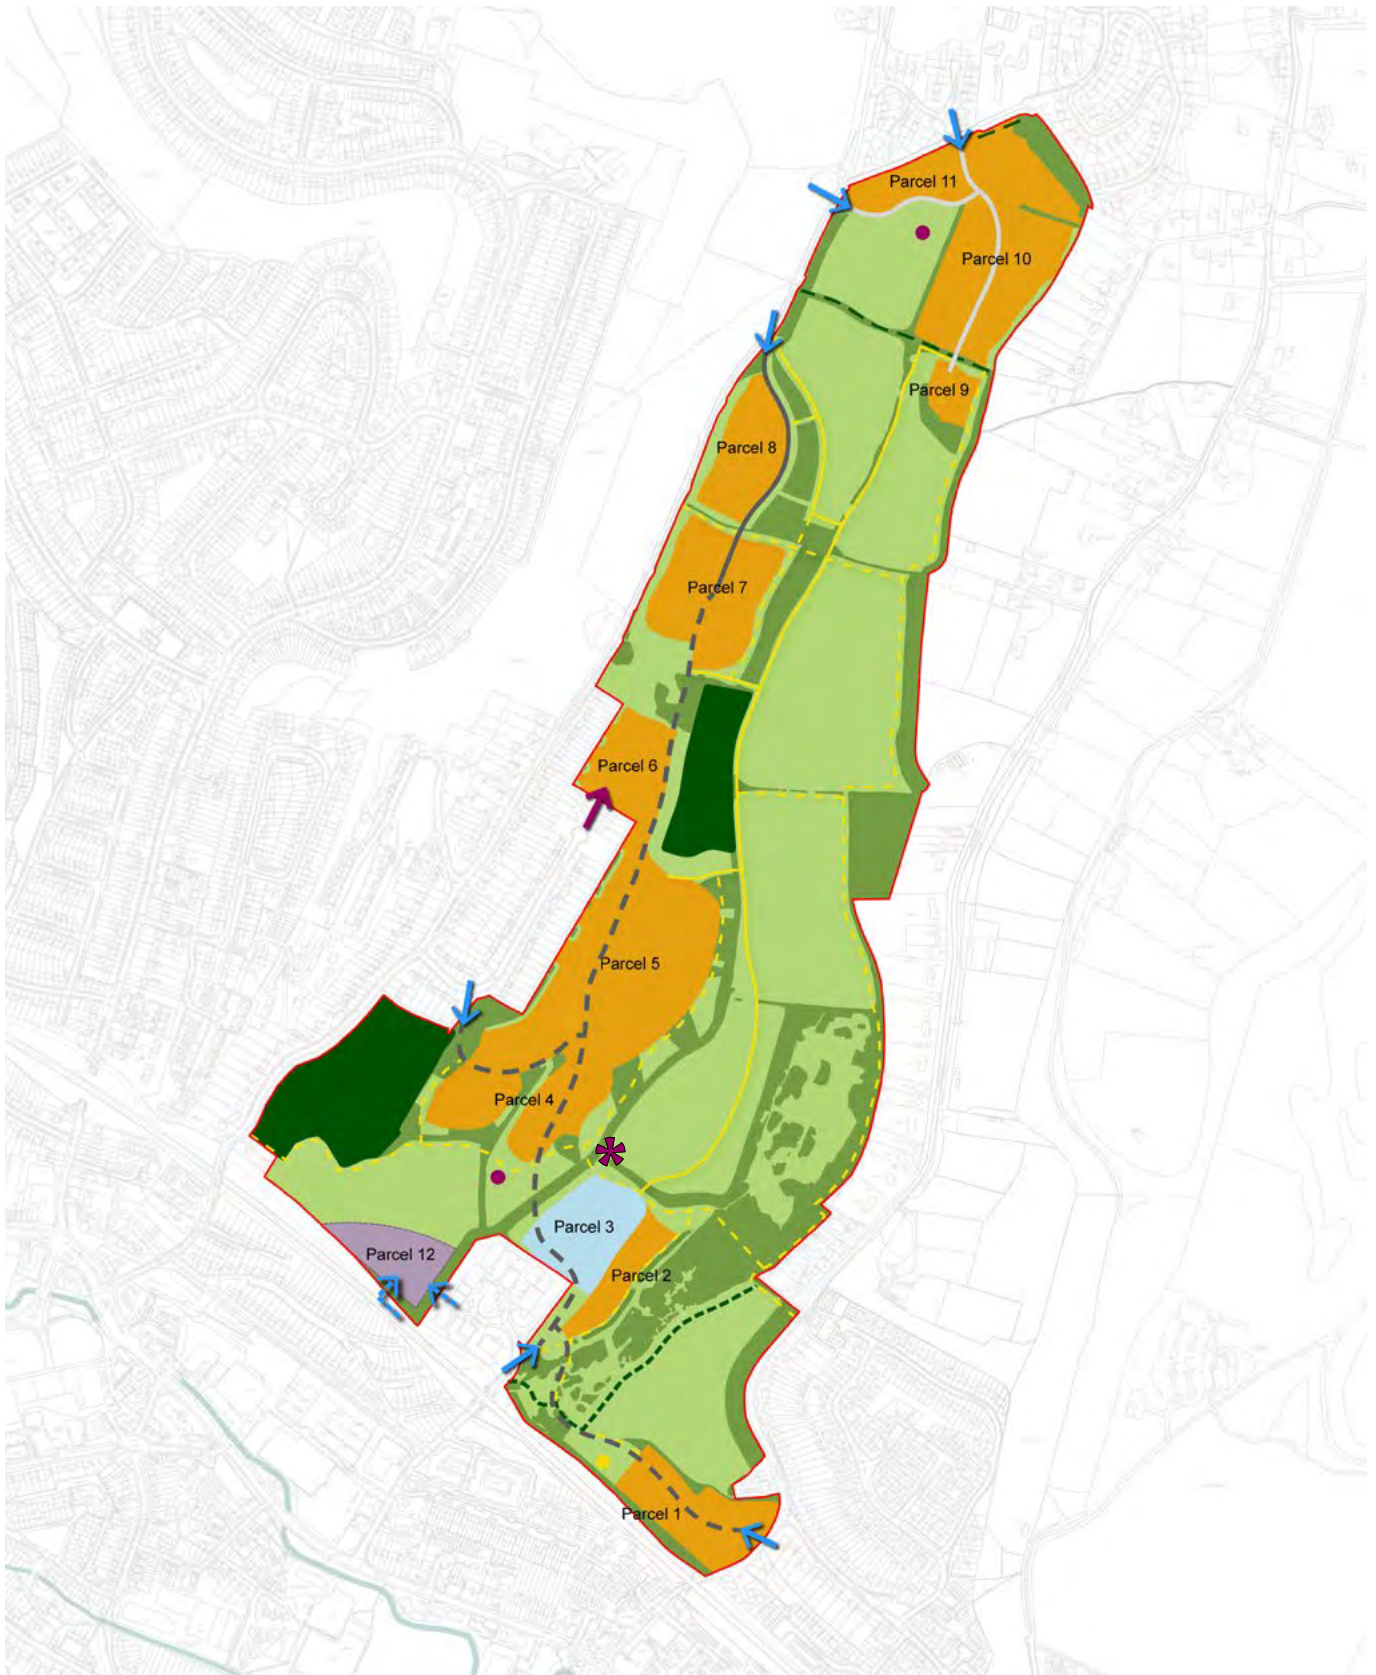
DEVELOPMENT FRAMEWORK PLAN SPINE ROAD OPTION B
